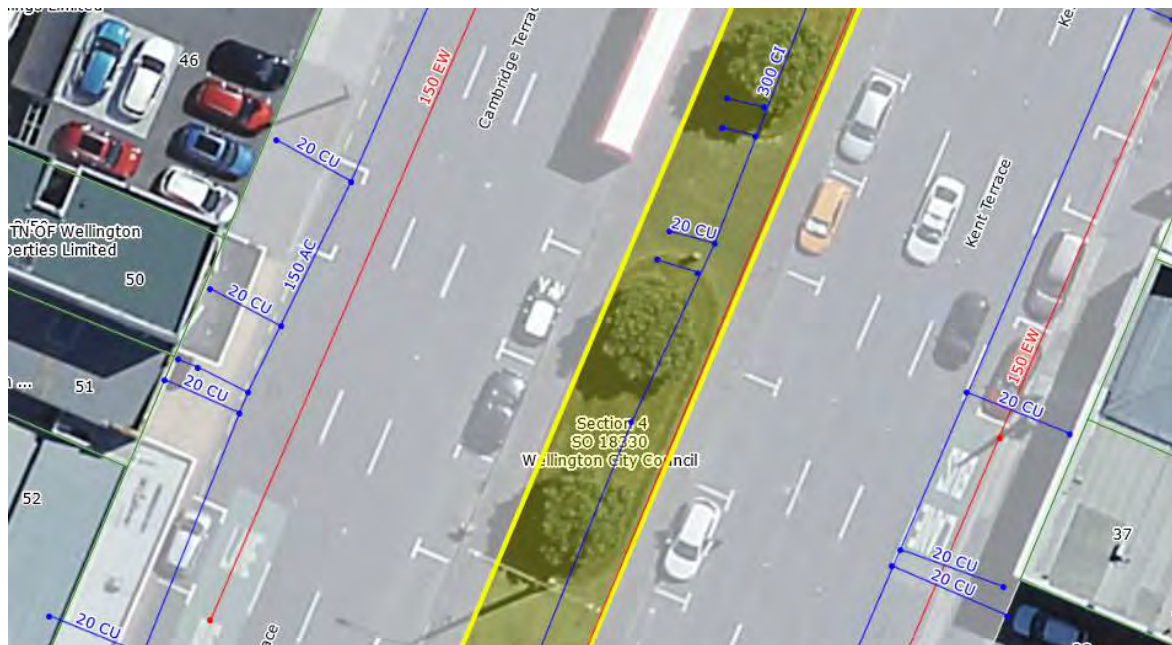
Shows a section of Cambridge Terrace and Kent Terrace
